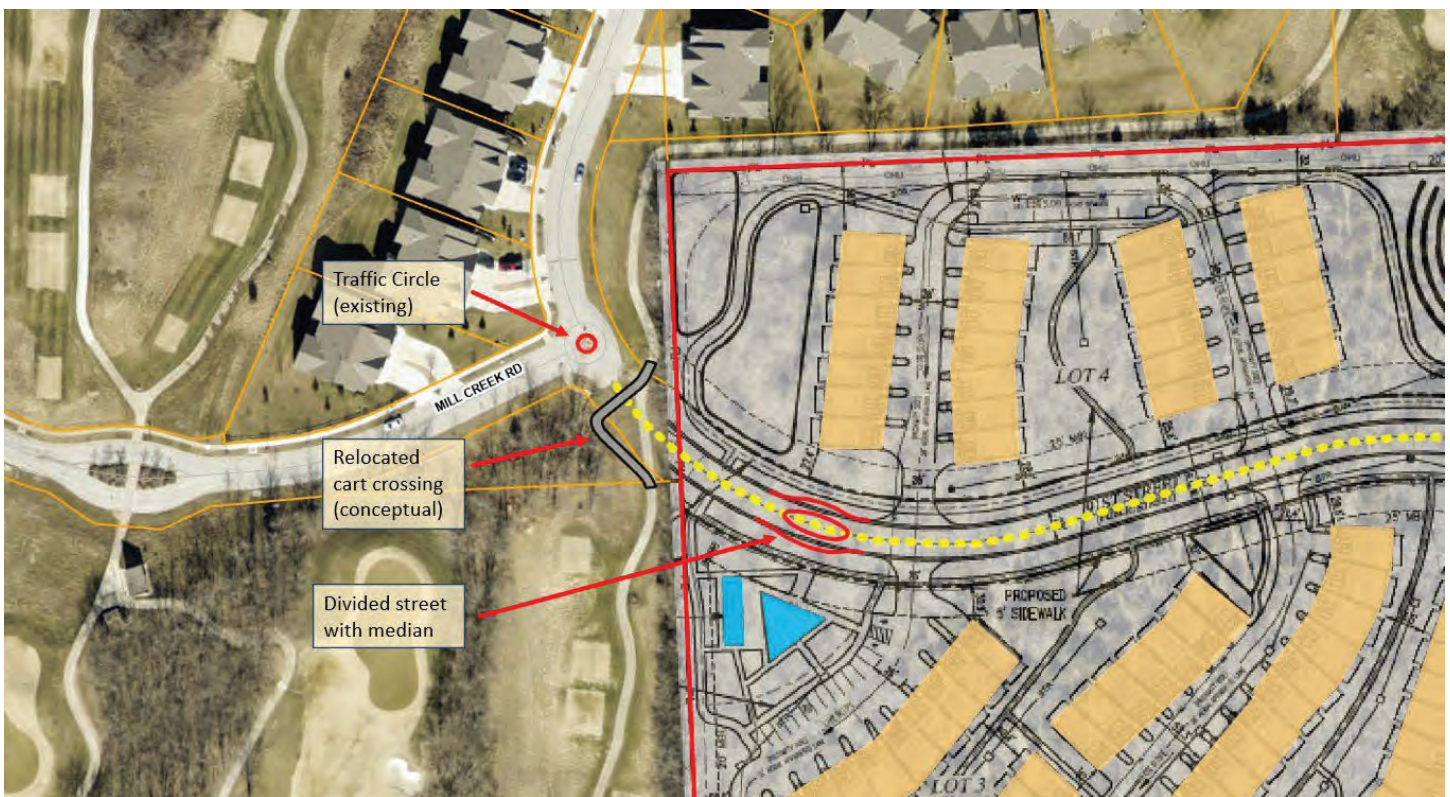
REVISED SUBMITTAL Phasing Plan.
